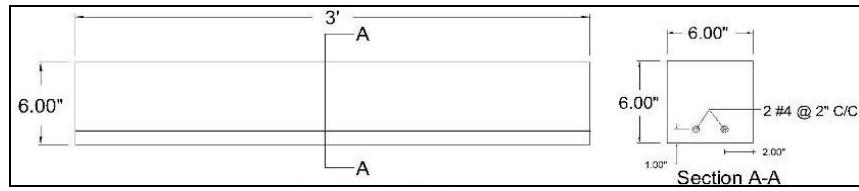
Dimensions of reinforced concrete beam with two embedded rebar rods
